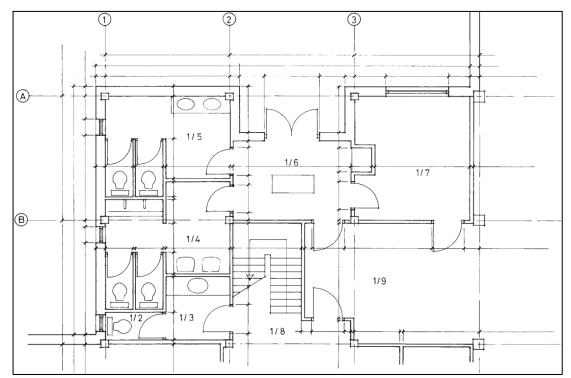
Typical dimensioning and construction lines location of floor plan (Styles & Bichard, Site Plans, 2004).
